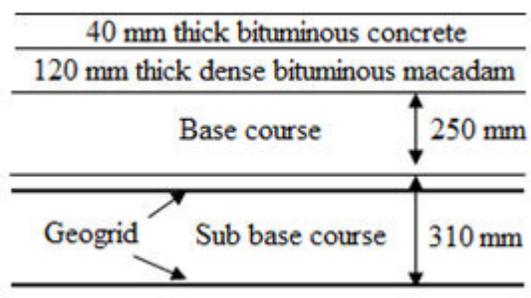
Design section of flexible pavement with geogrid sub base mattress
